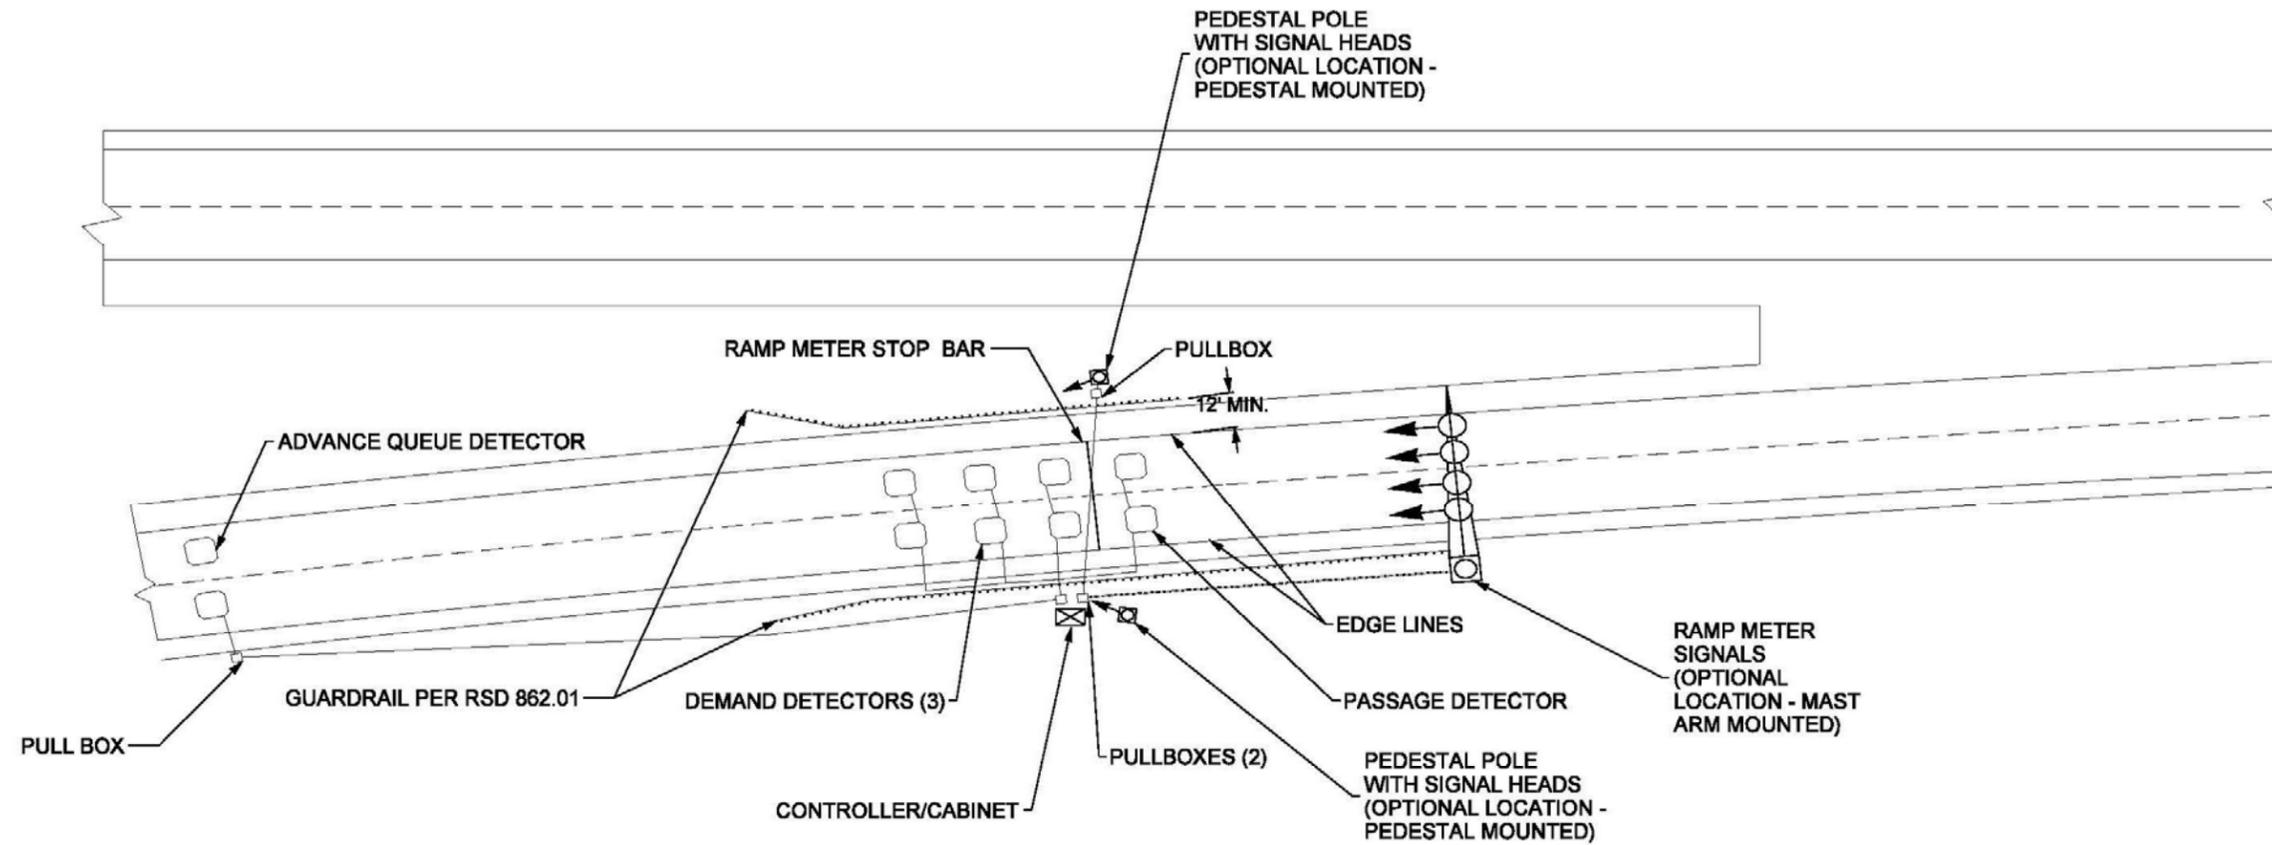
Single Lane Ramp Meter with Transit Bypass Signalization and Equipment Layout
